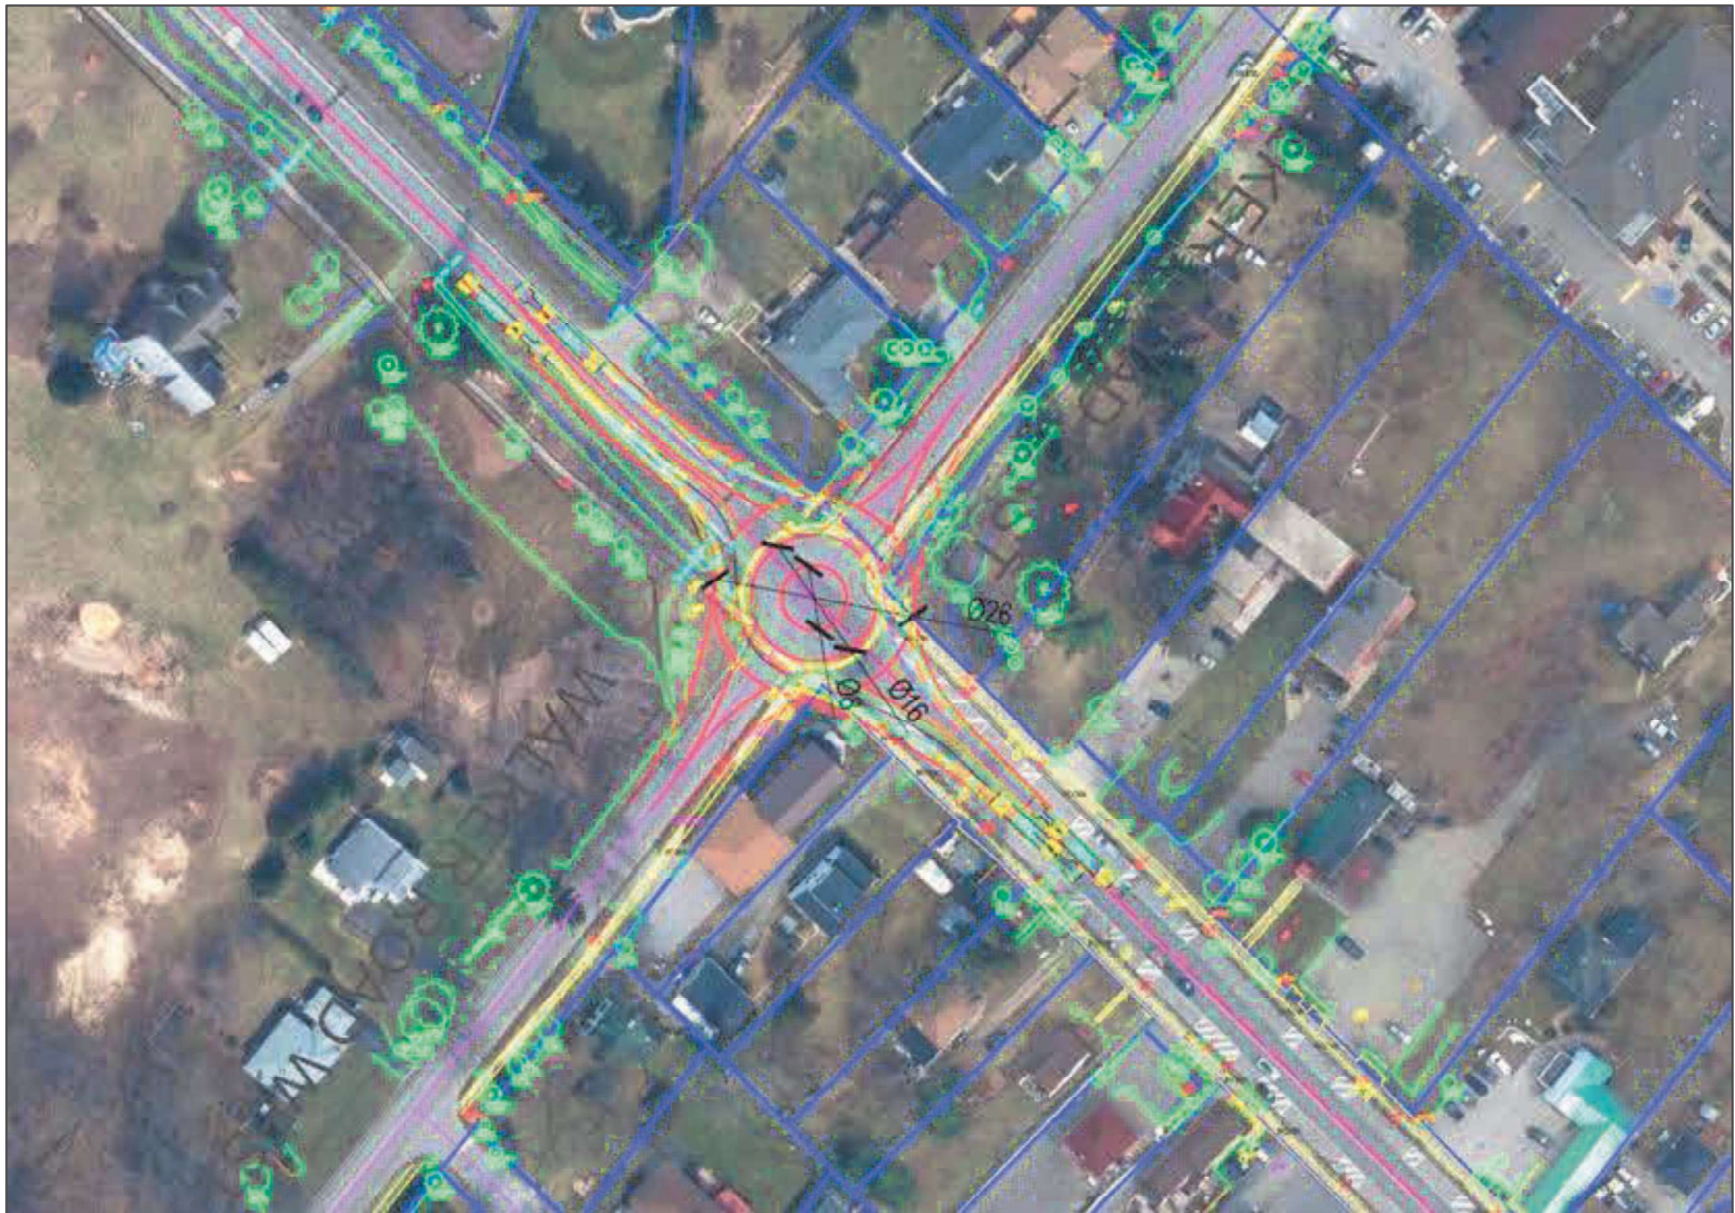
Roundabout Concept Plan for Airport Road & Cranston Drive
